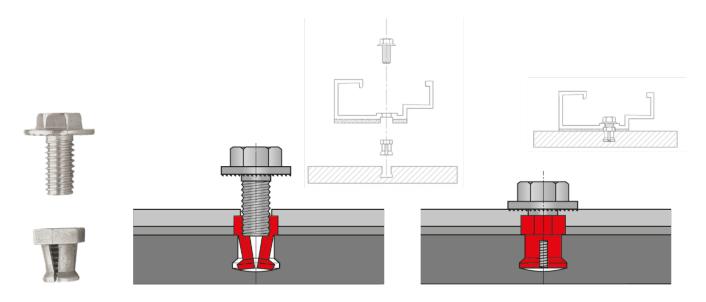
KEIL UNDERCUT ANCHOR KH INSTALLATION
